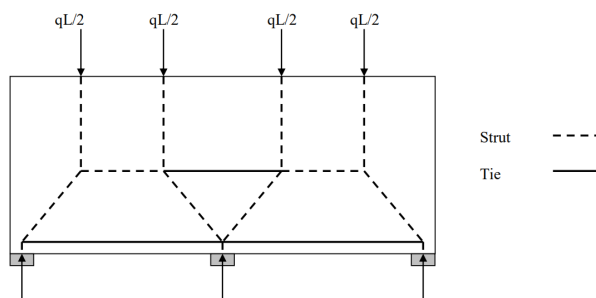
Strut-and-tie model for continuous wall girders
